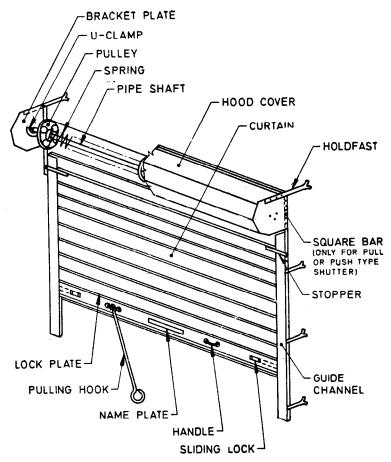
Component Parts of Self-Coiling Rolling Shutter
